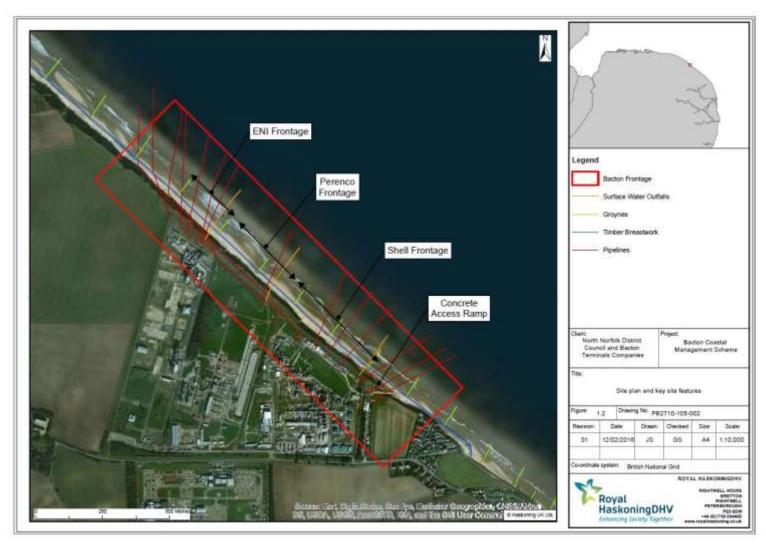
Bacton Gas Terminals Site Plan and Site Features
